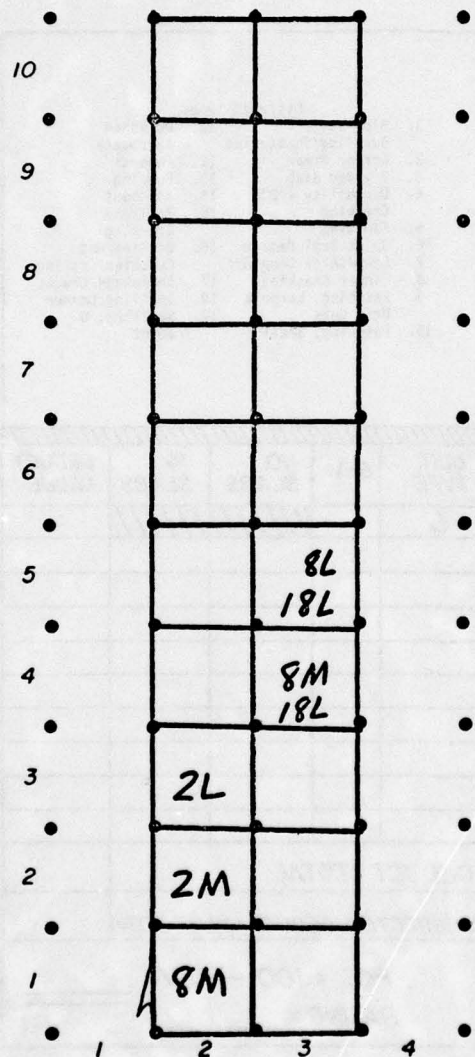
Illustration of division of a pavement section into sample units of 20 slabs.
